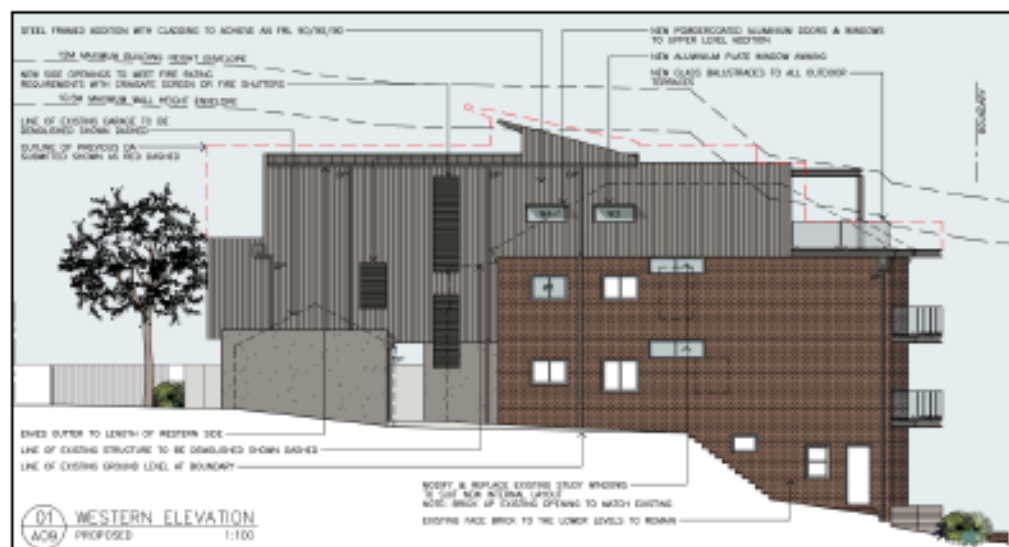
Excerpt of western elevation of approved alterations and additions at No. 22 Cliffbrook Parade (DA885/2016)
